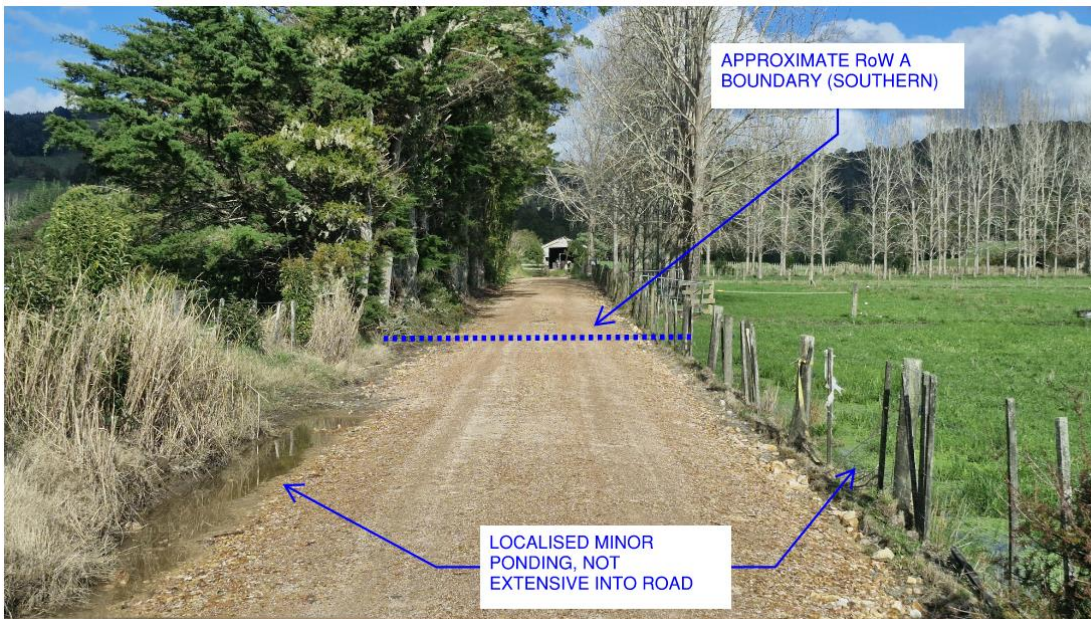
RoW A, near southern end, looking south, localised ponding (Observation Points 11 & 12)
